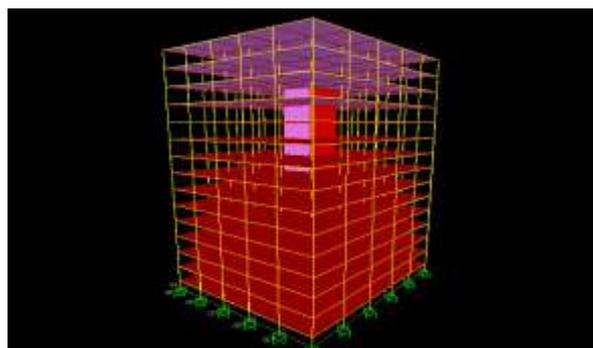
3D View Line Type Shear Walls at Centre of the Building
